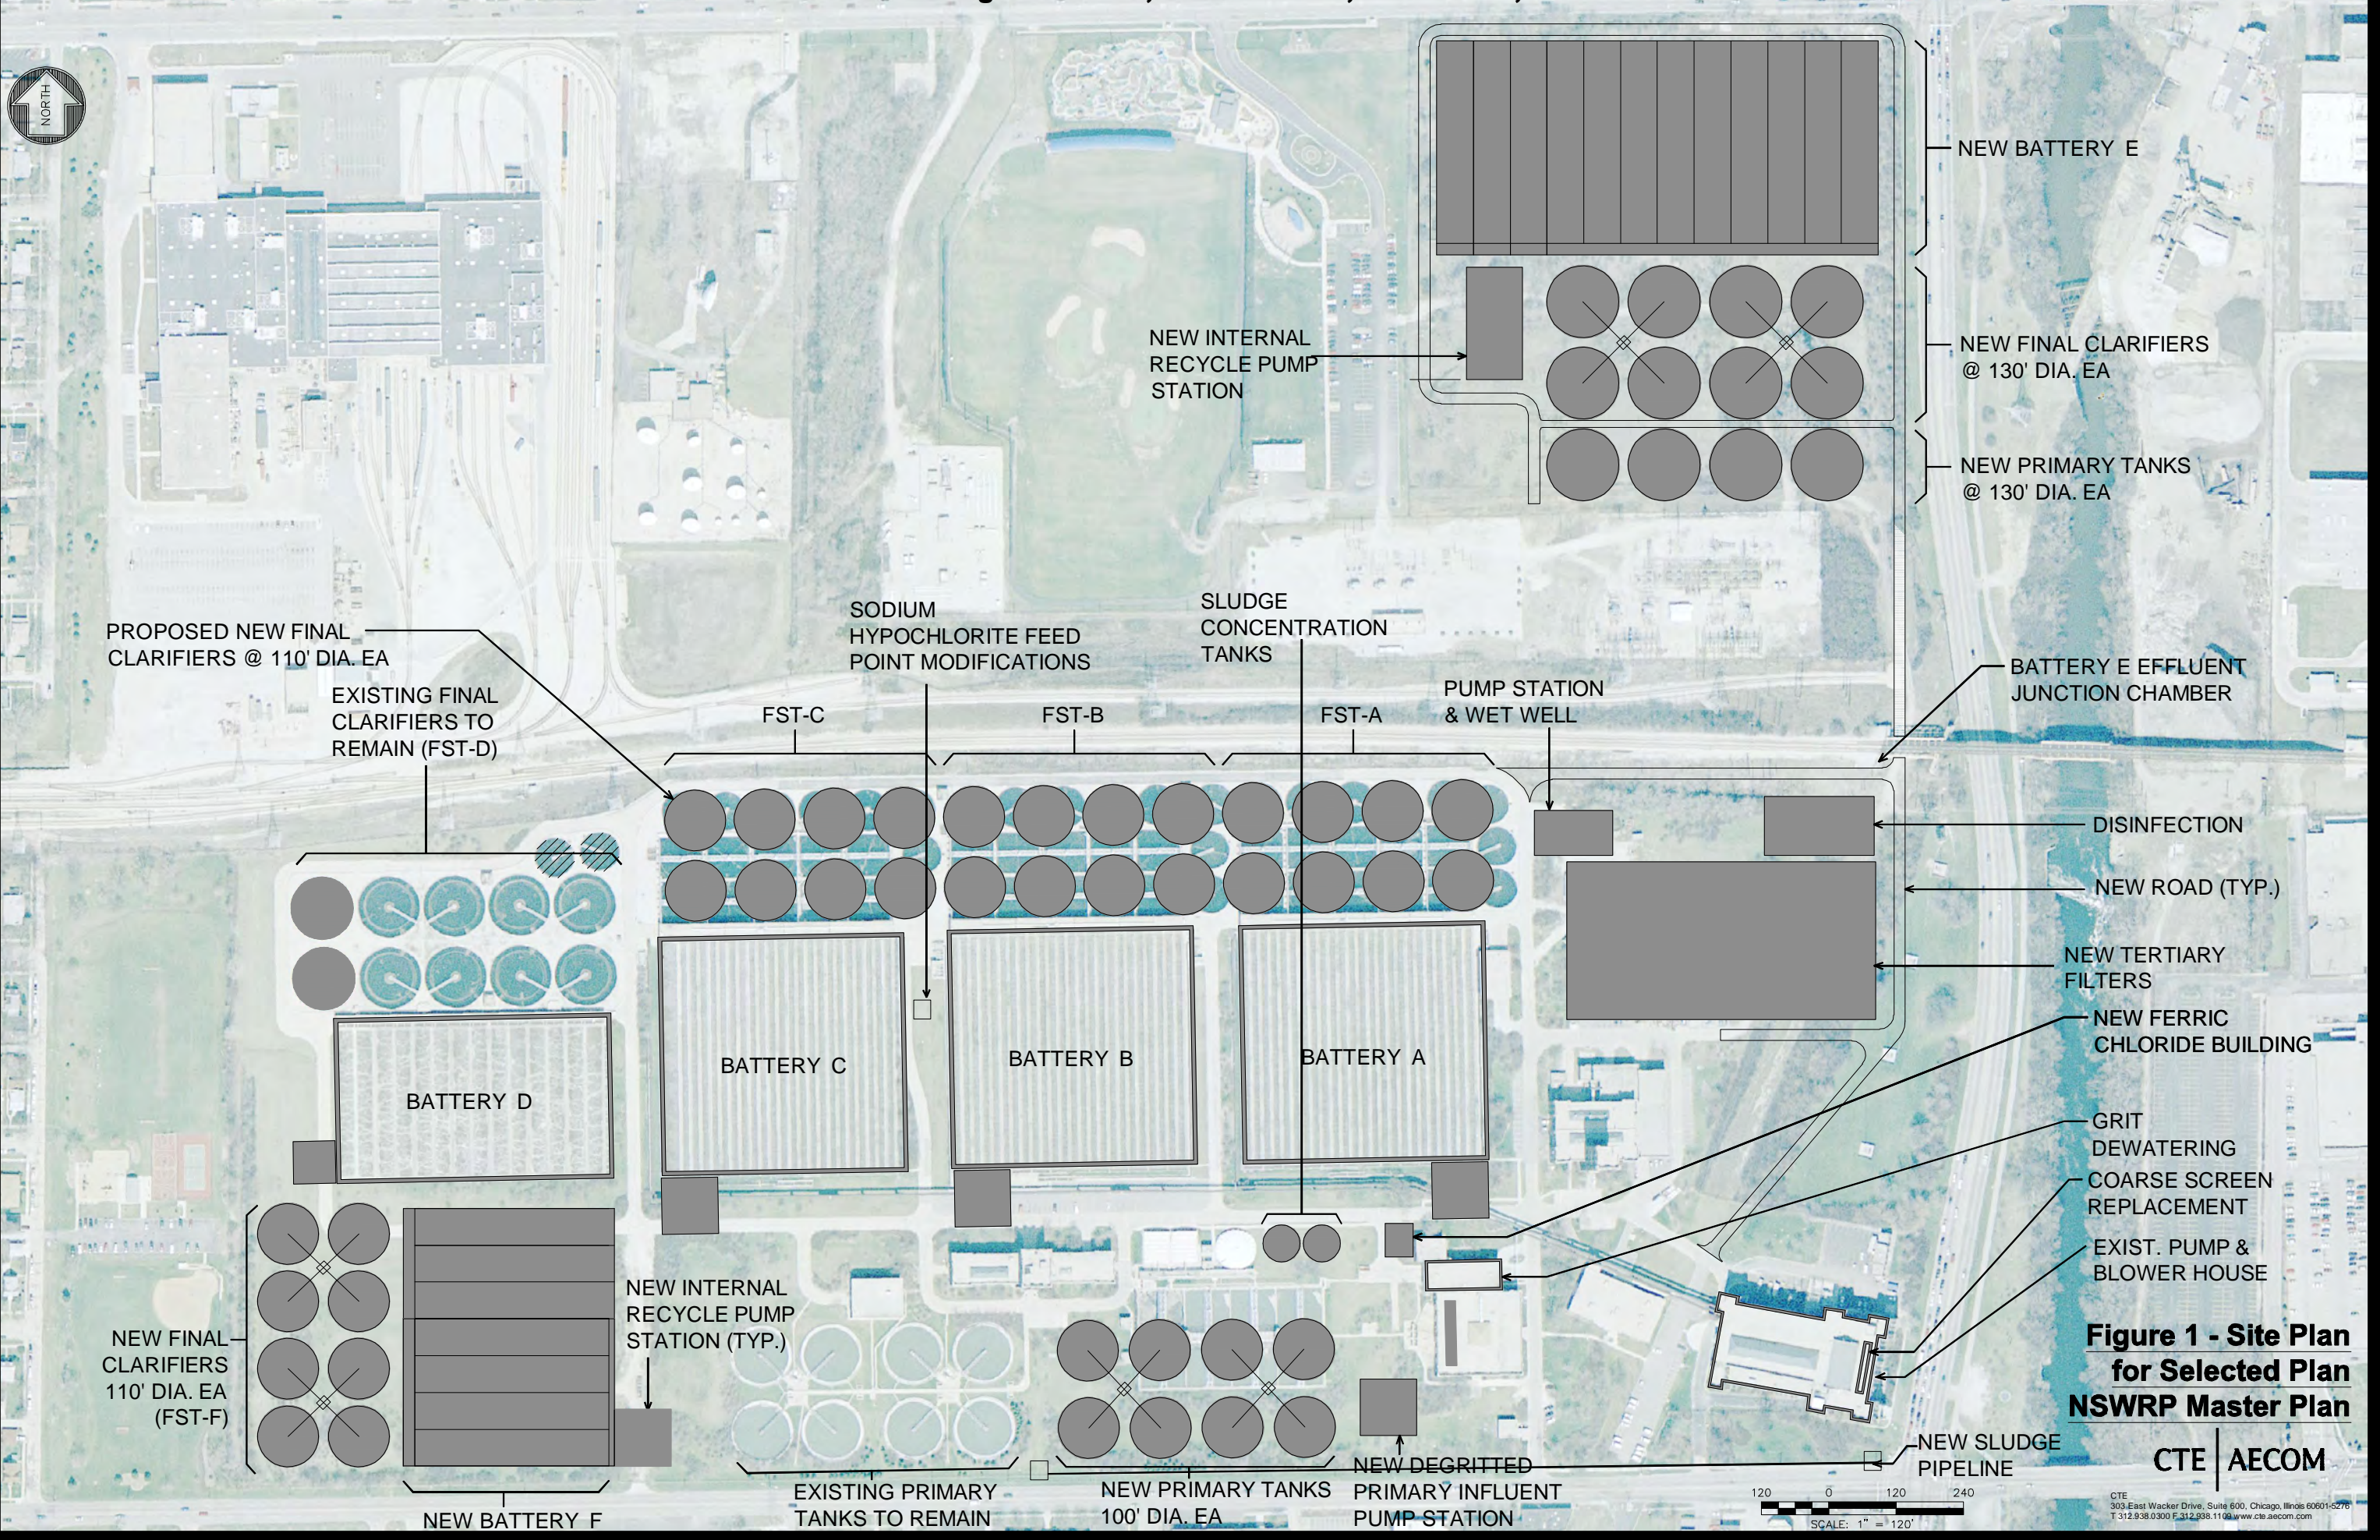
Site Plan for Selected Plan NSWRP Master Plan
